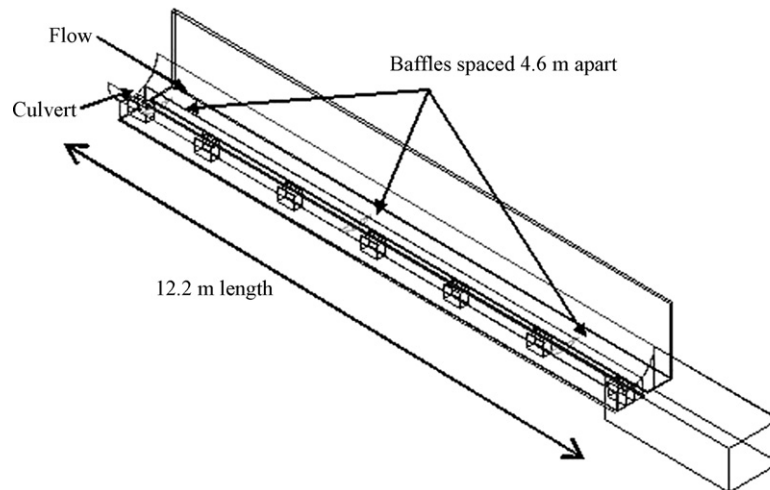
The test culvert located at the Albrook Hydraulic Laboratory, WSU, Pullman.
